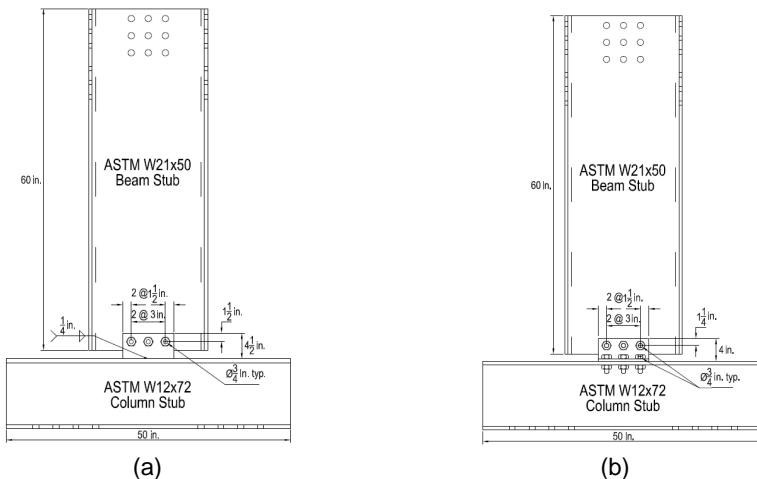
(a) Typical single-plate shear specimen, and (b) typical bolted angle specimen (1 in = 25.4 mm). For both: dimensions vary, see Tables 1 and 2.
